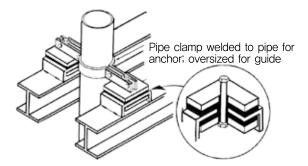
Acoustical Barriers For Pipe Anchors and Guides
